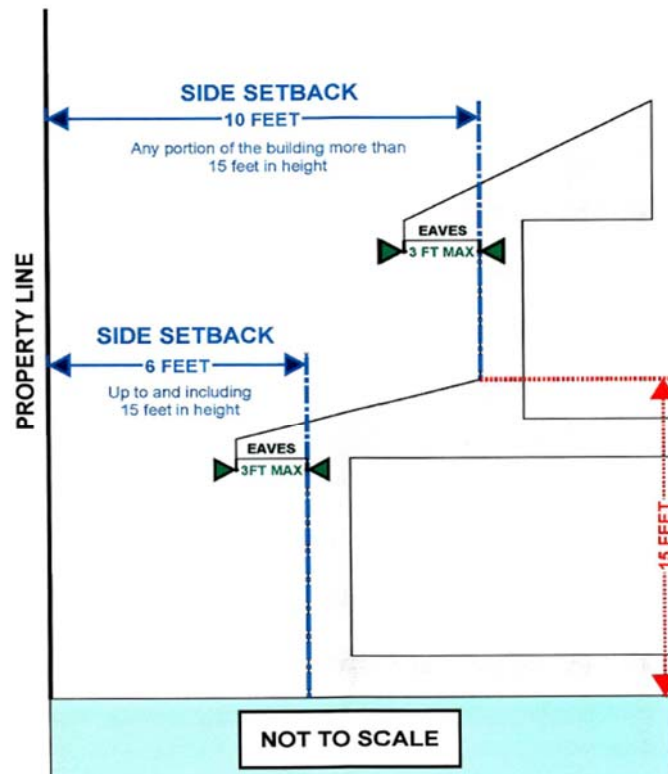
Example of rear and side setback areas for single-family dwelling >15 feet in height (not to scale)
